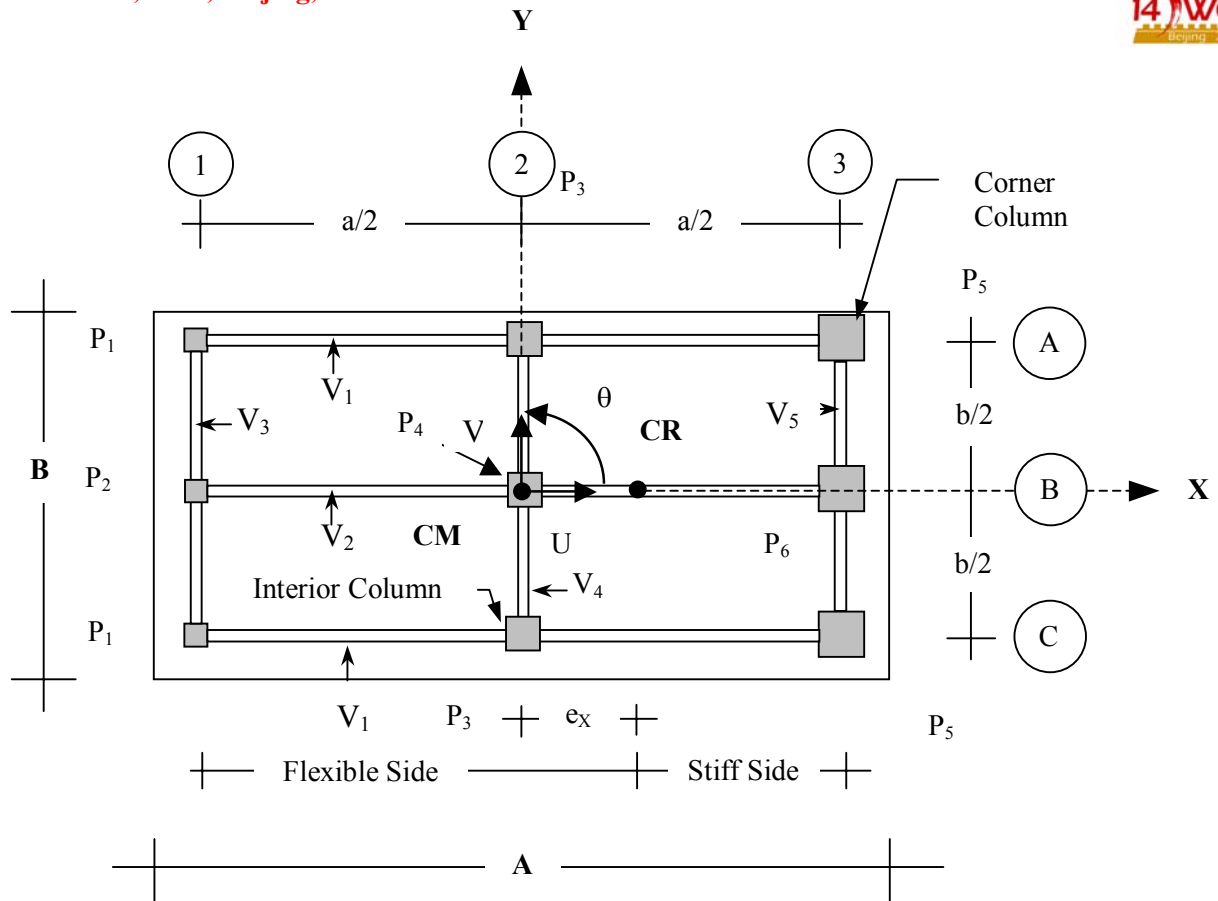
Typical Plan of the Three-Dimensional Structural Model.
